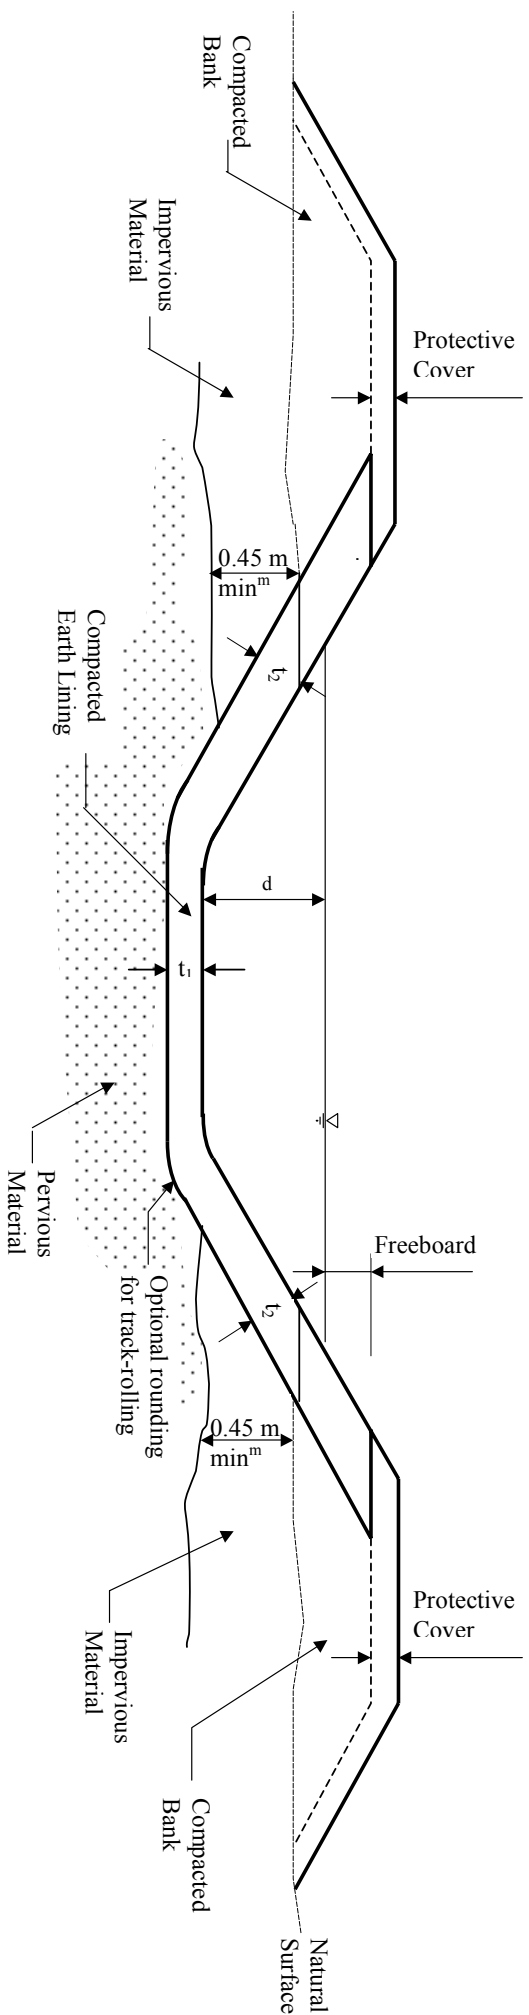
Typical Compacted Earth Lined Section – Bed only
